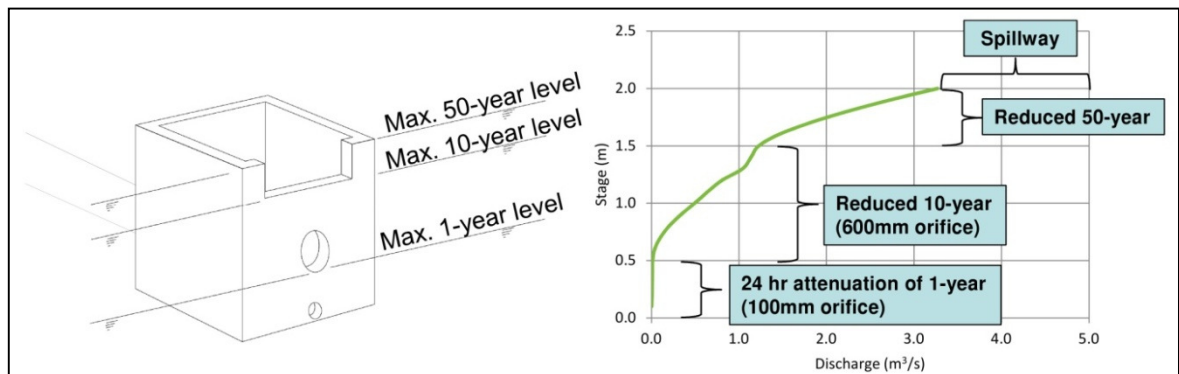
Typical multi-stage outlet structure used for modelling purposes
